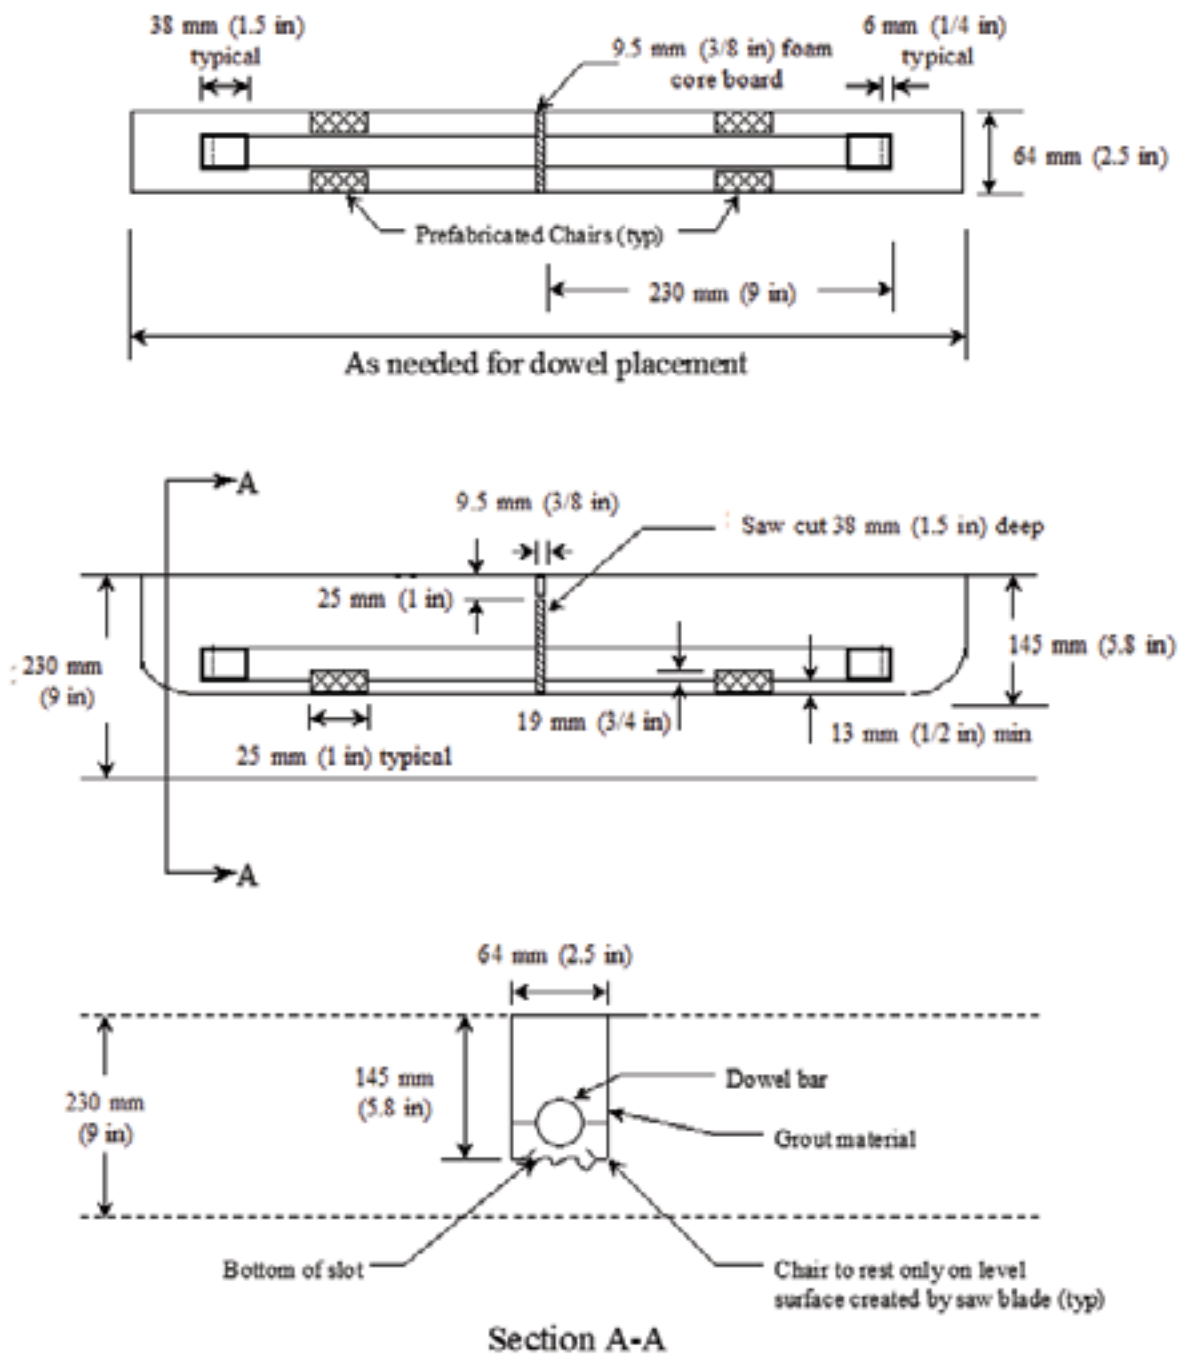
Example of DBR installation details (Pierce et al. 2003)
